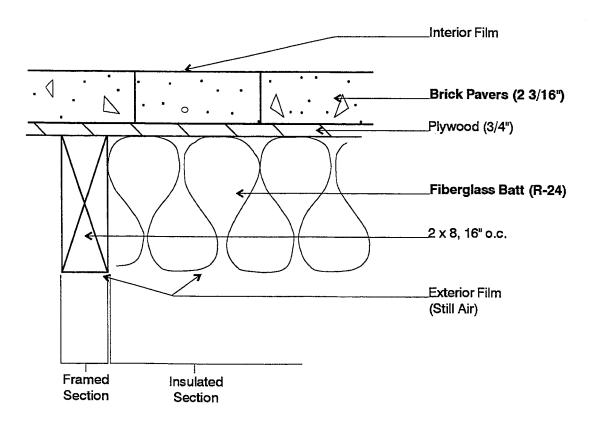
Mass floor above vented crawl space, section—Case P100A
